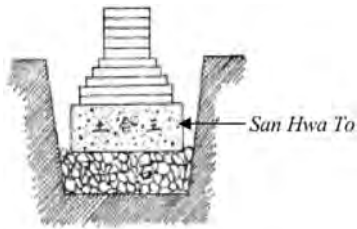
Drawing of *San Hwa To* foundation (Zhang 1910).
